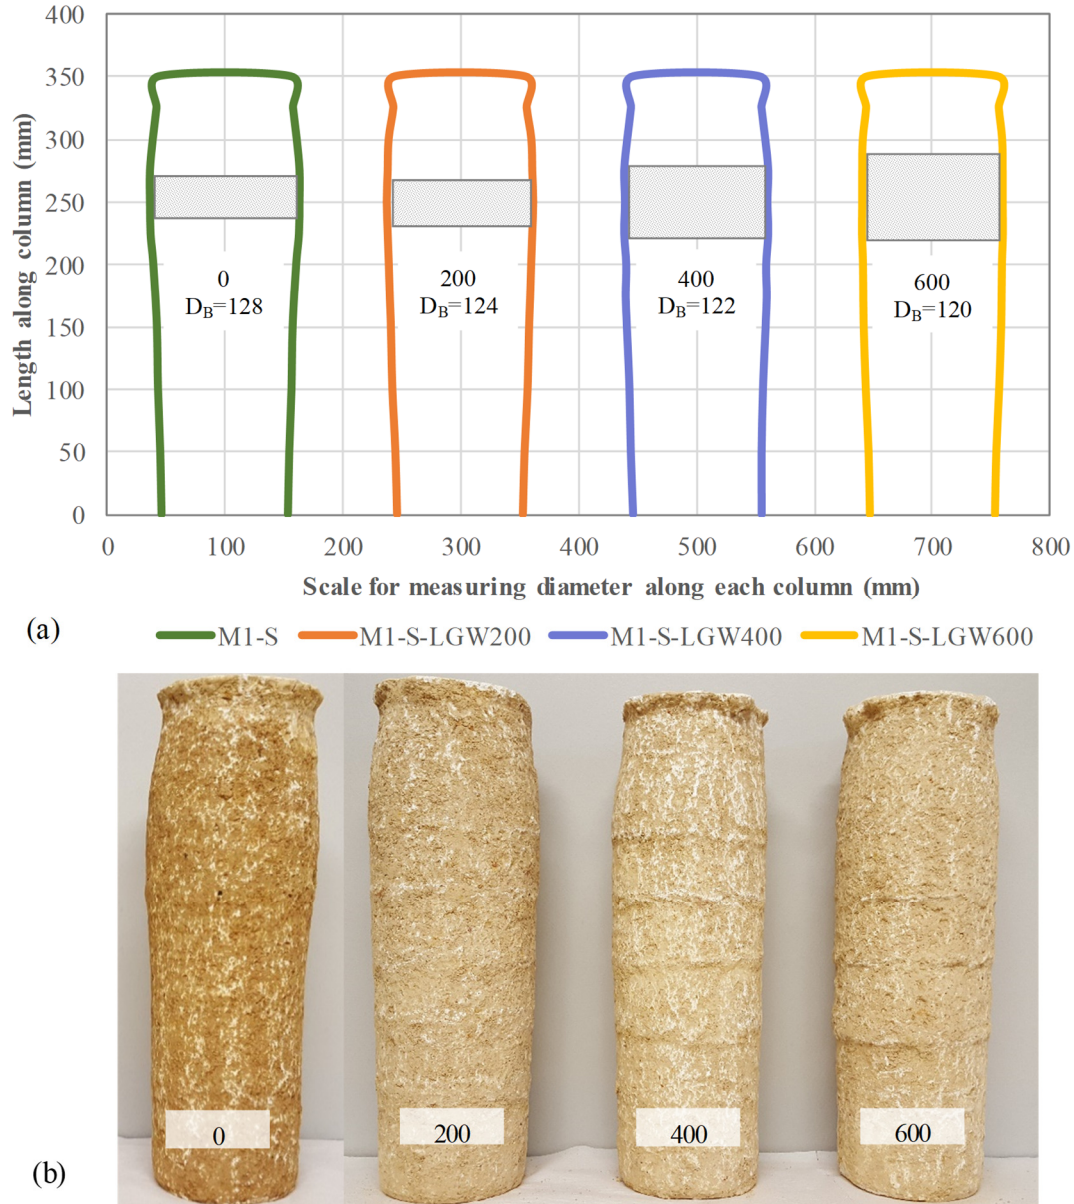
Deformations of tested columns reinforced with layers of Betatex geotextile (GW), and installed in a base silt at OMC, (a) graphical plot and (b) pictorial illustration
